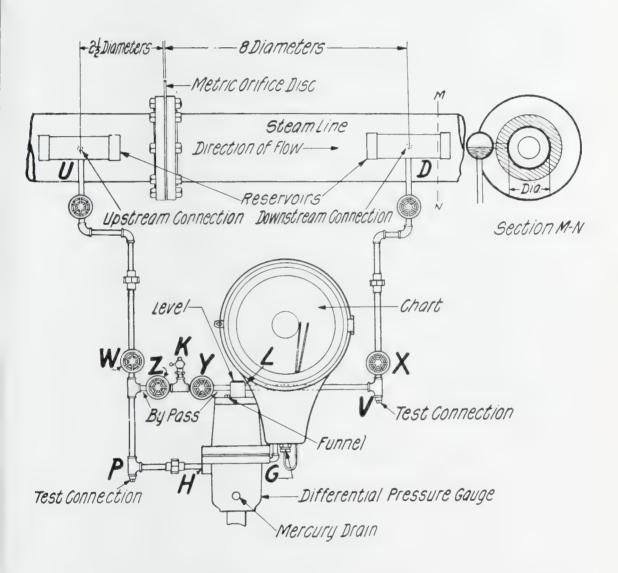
50 INCH GAUGE INSTALLATION FOR MEASURING STEAM
